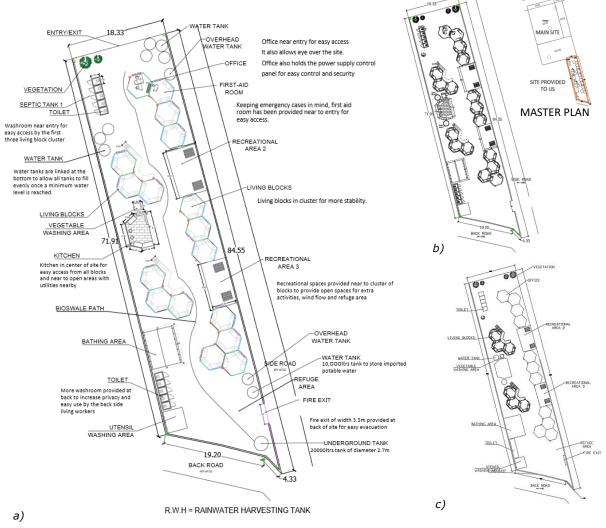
a) Site plan, b) Ground floor plan, c) first floor plan
